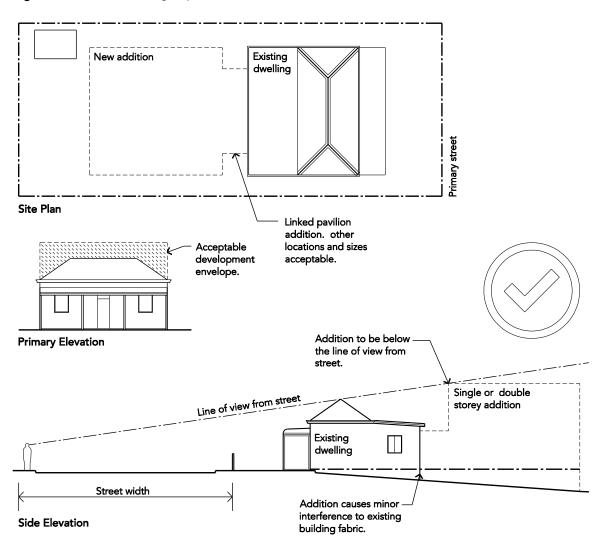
Plan and elevations illustrating compatible alterations and additions - Griffiths Architects 2012.
